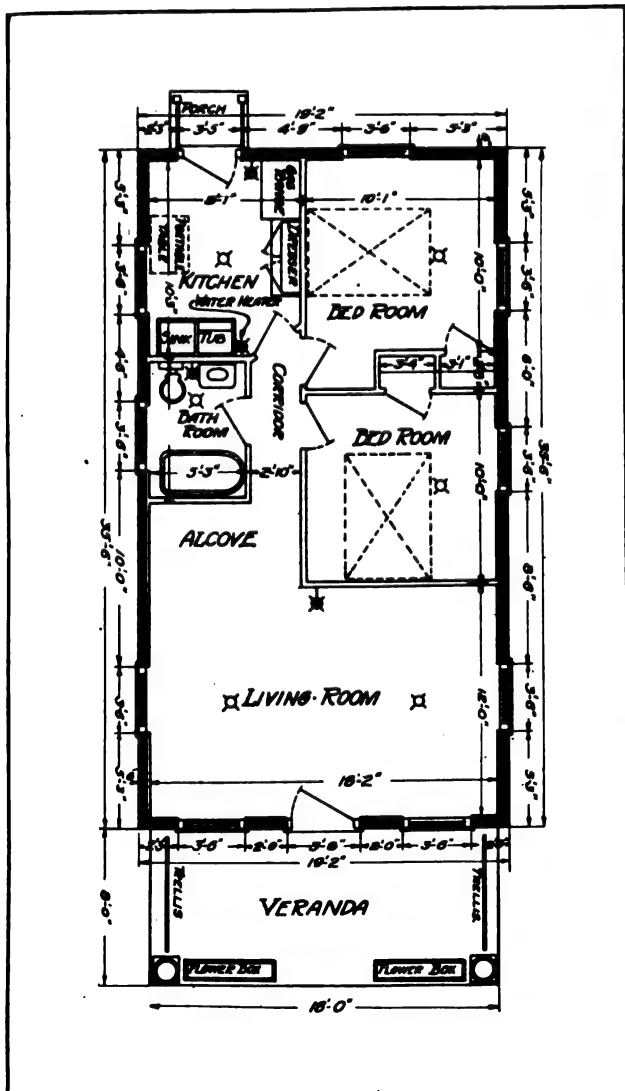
FLOOR PLAN OF FIRST 34 MANHATTAN BEACH COTTAGES
